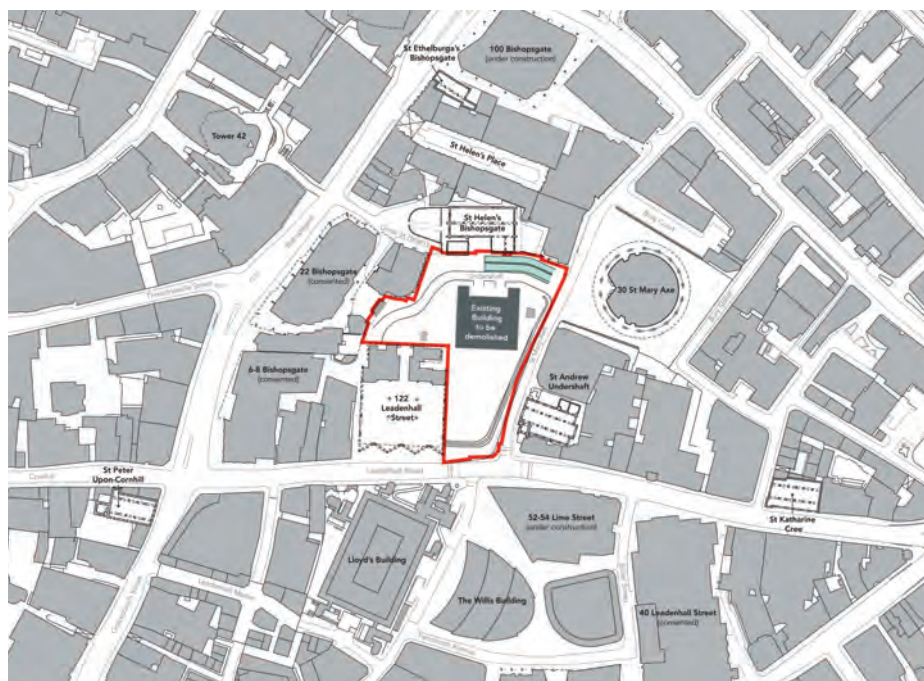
Existing site plan. (Source: Eric Parry Architects)
